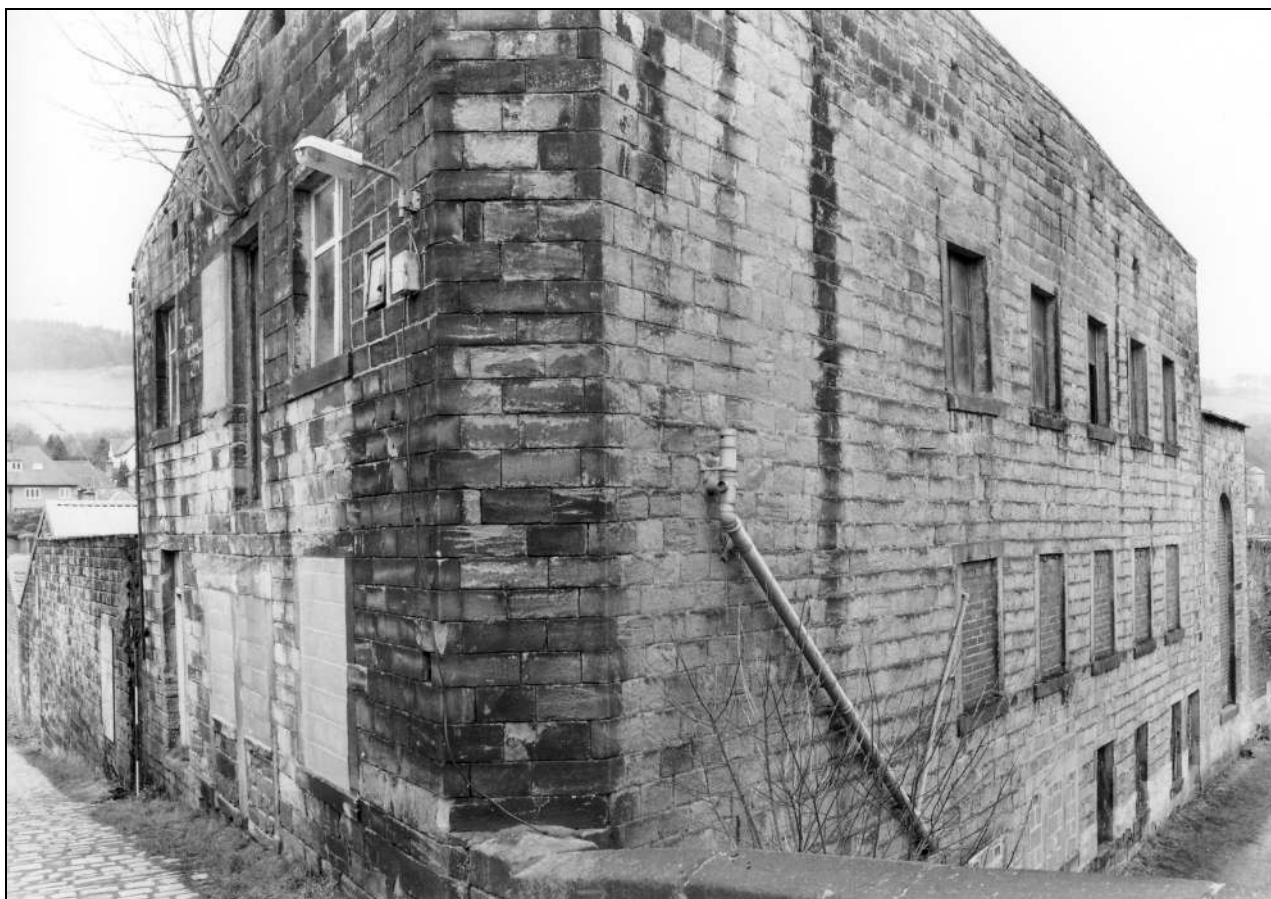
North-east corner of spinning mill, from across Bings Road (film 8, frame 16)
